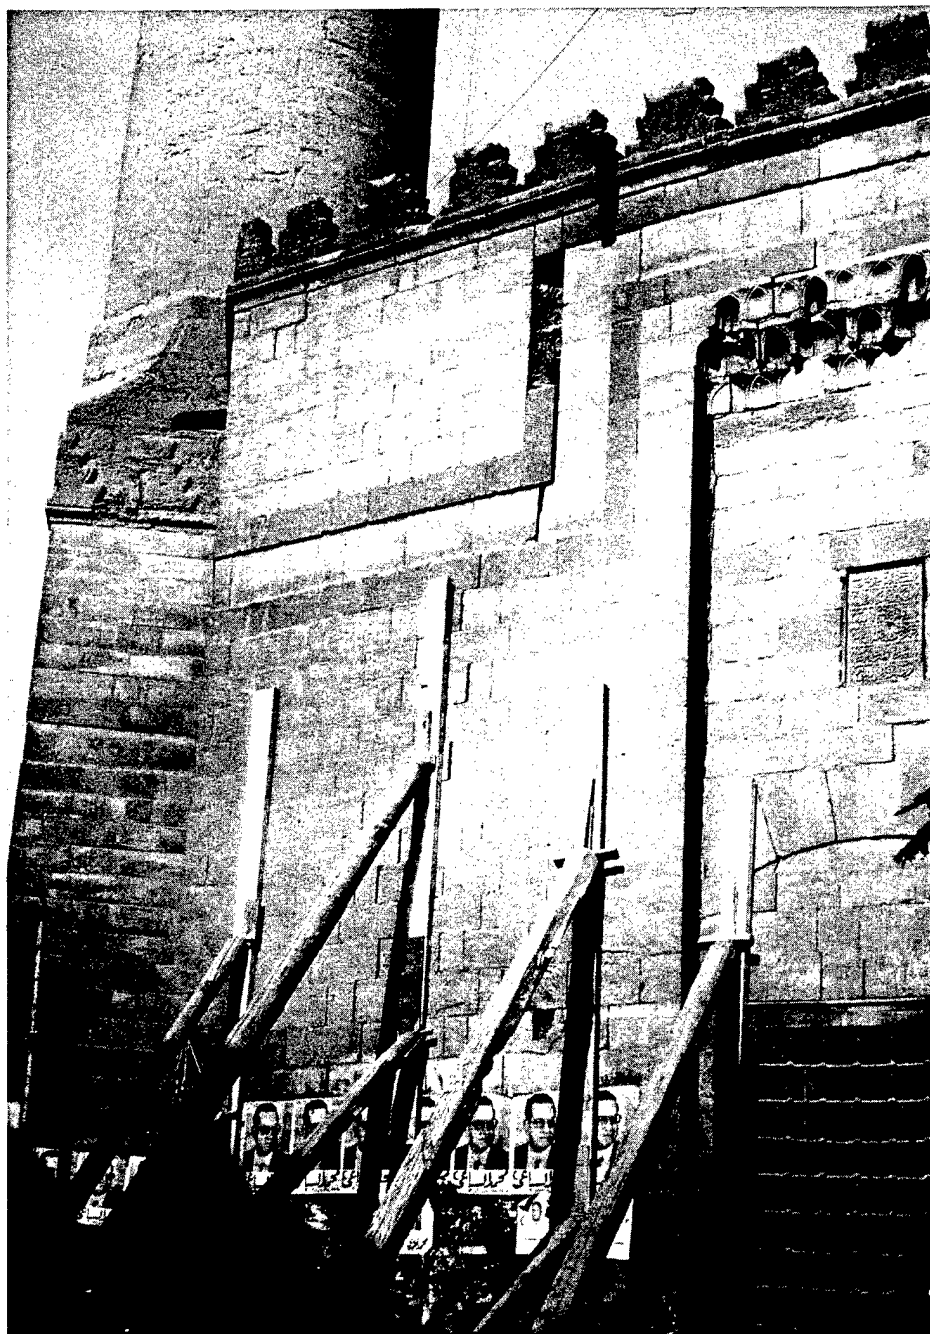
Exterior wall and base of minaret at Mosque of Ibrāhim Aghā Mustahfizān looking northeast showing cracks, distortions, and bracing
